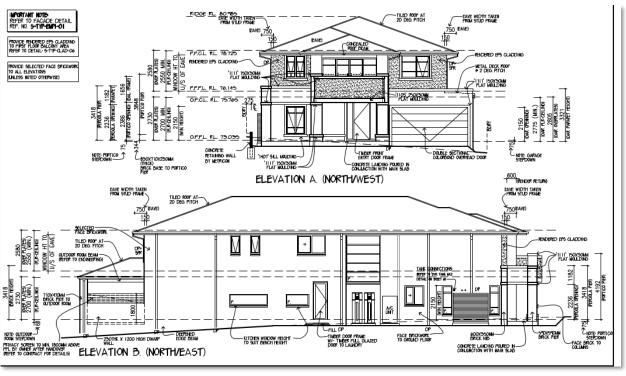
Proposed front (North-West) and side (North-East) elevations.
